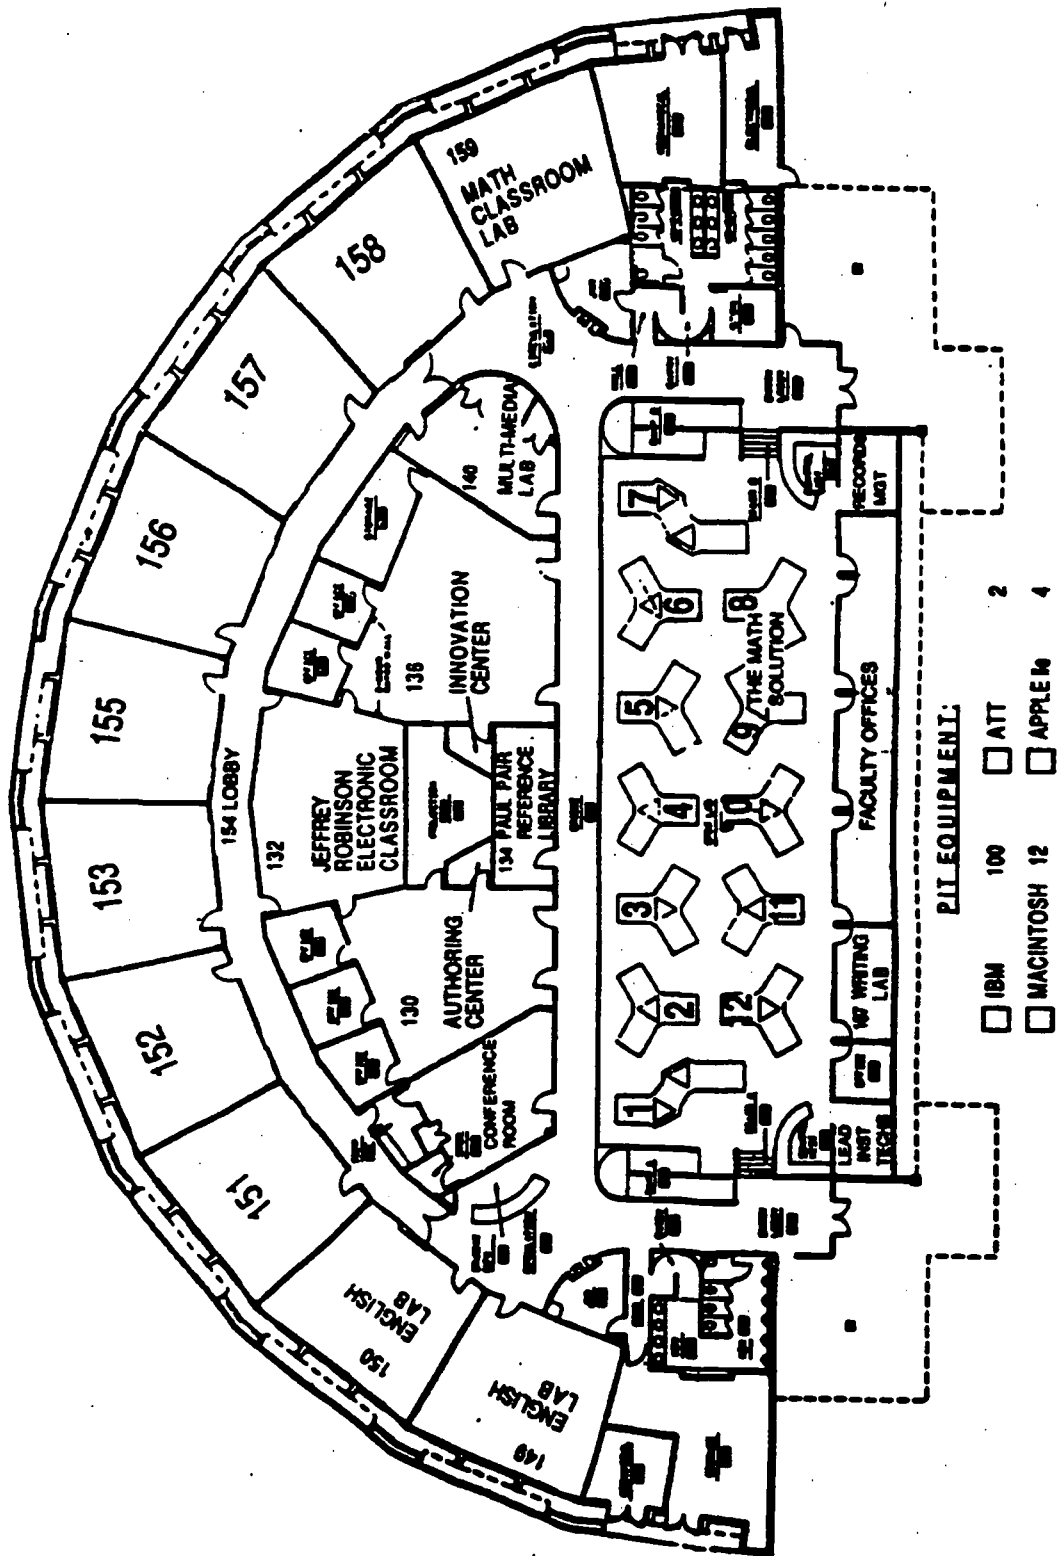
Floor plan for High Tech Centre #2, Glendale Community College, Arizona.
